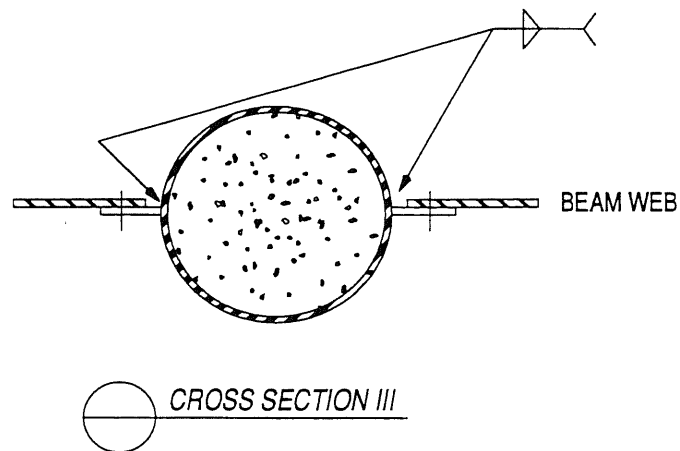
Beam-to-Column Connection Using Finplates, Shakir (1992)
